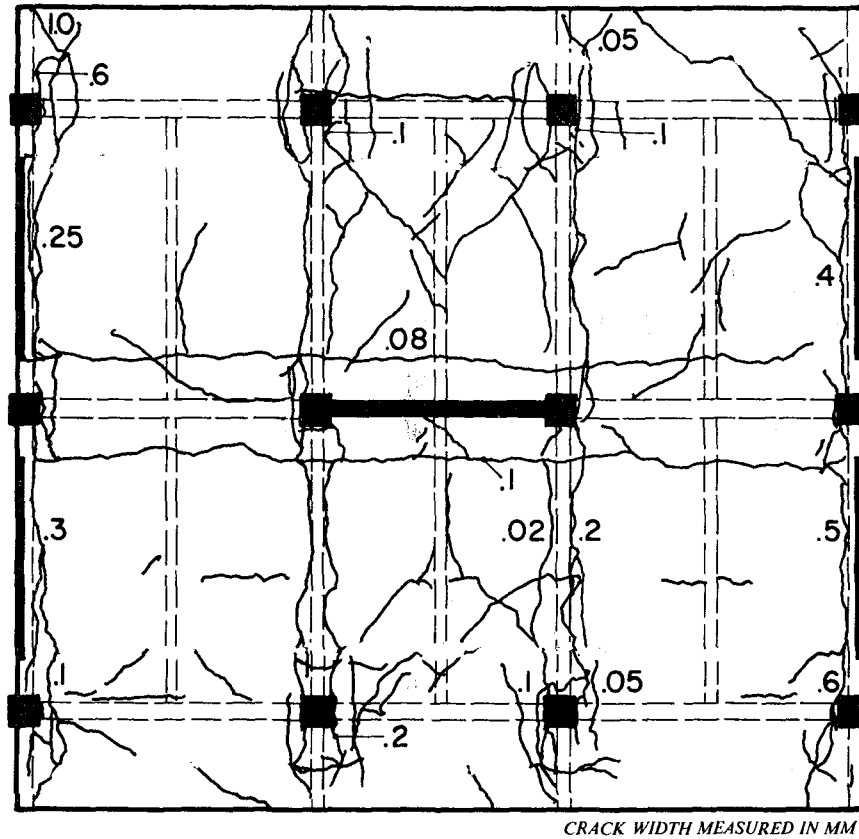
CRACK PATTERN OBSERVED AT TOP OF FIRST FLOOR SLAB AFTER T 46.3 TEST (1 mm = 0.0394 in.)
